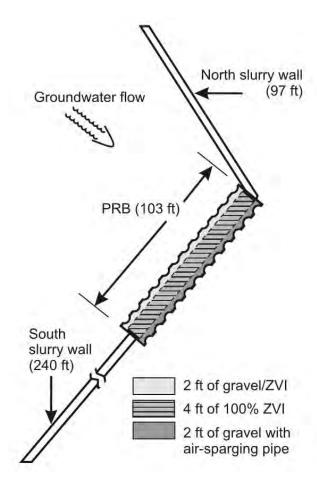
Components of the Permeable Reactive Barrier and Slurry Wall System
